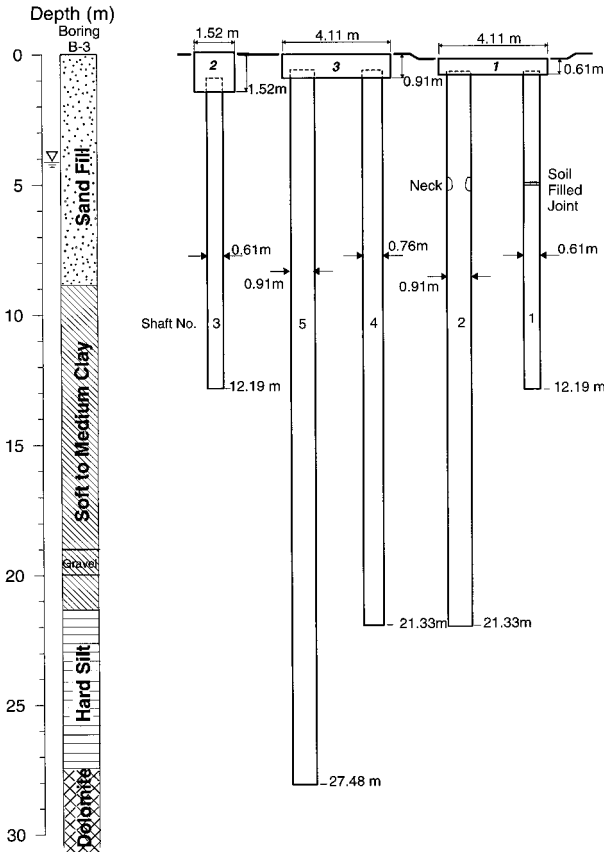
Cross Section of NGES Deep Foundation Test Section
